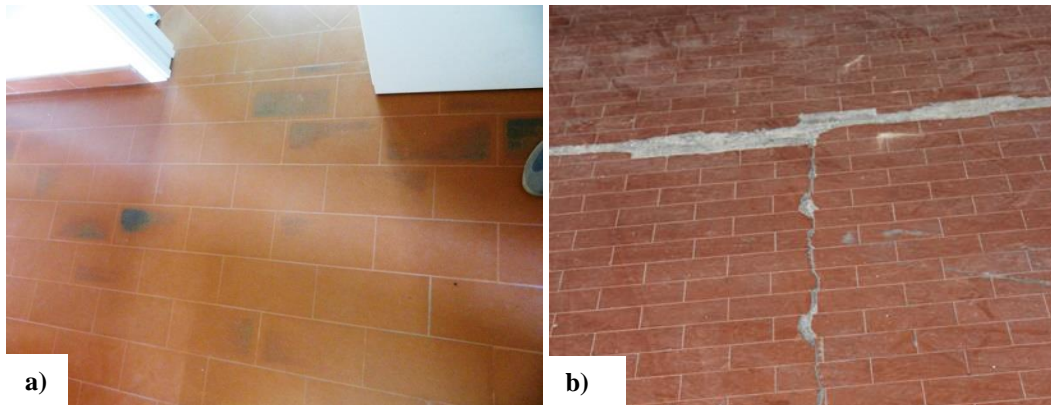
Examples of damages: a) Stains on a flooring; b) Detachment of the flooring tiles
